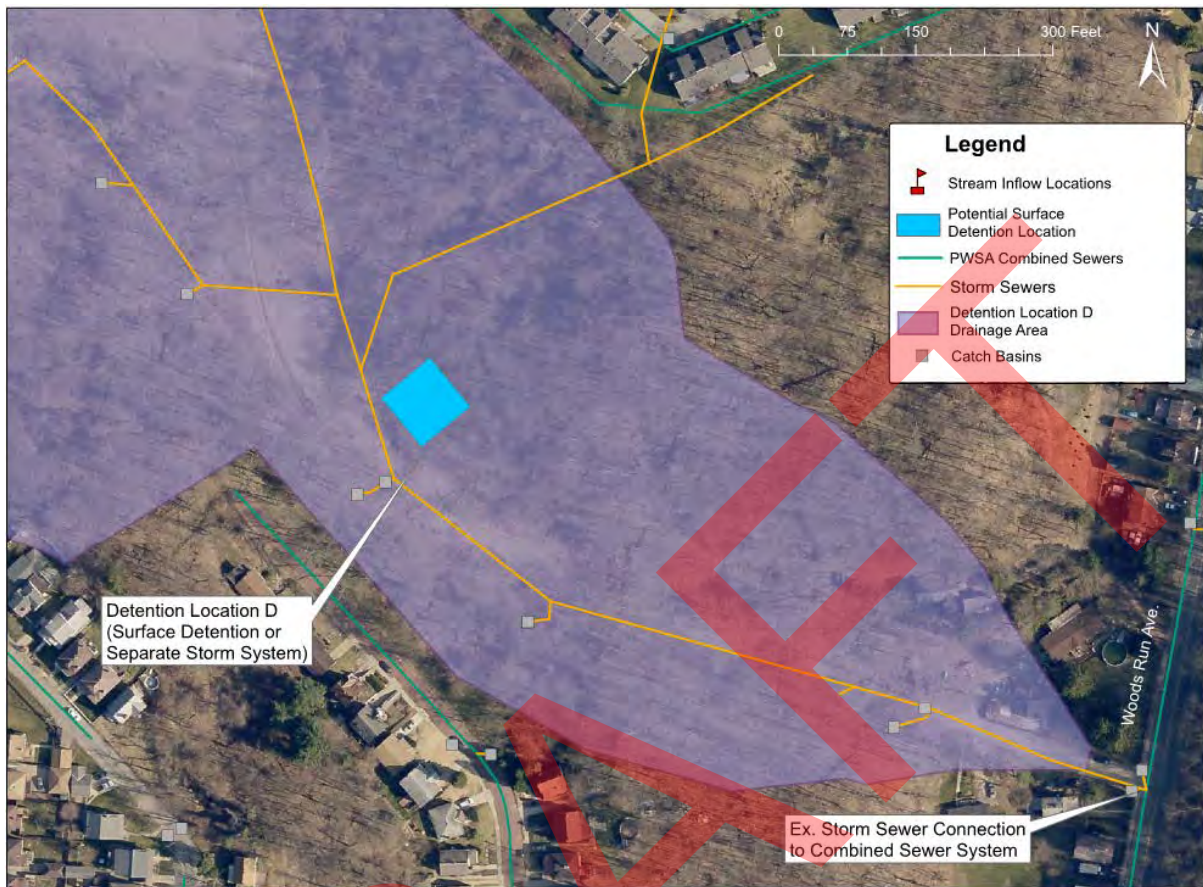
Close-Up of Woods Run Stormwater Runoff Detention Location D
